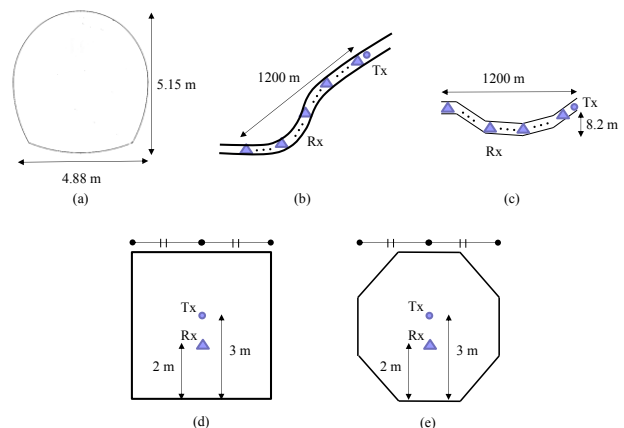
(a) Actual tunnel cross section. (b) Top view of tunnel with location of Tx and Rx. (c) Side view of tunnel. (d) Rectangular cross section and (e) 8-sided cross section used in simulation.
